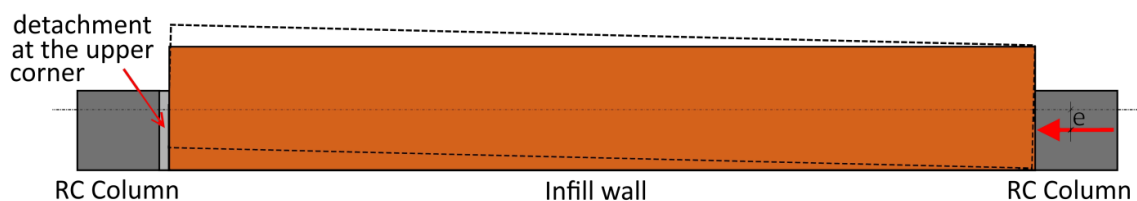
Top view: deformation of the frame and out-of-plane infill movement due to the eccentric loading of the infill wall
